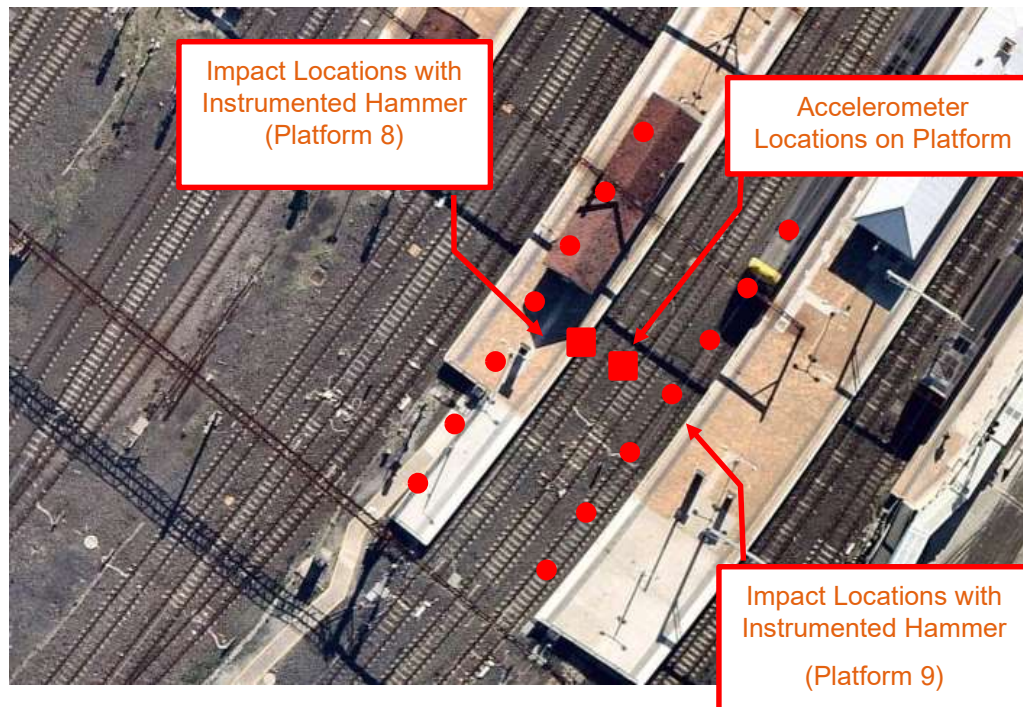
Plan showing Hammer Impact Locations and Accelerometer Locations (Platforms 8 and 9)
